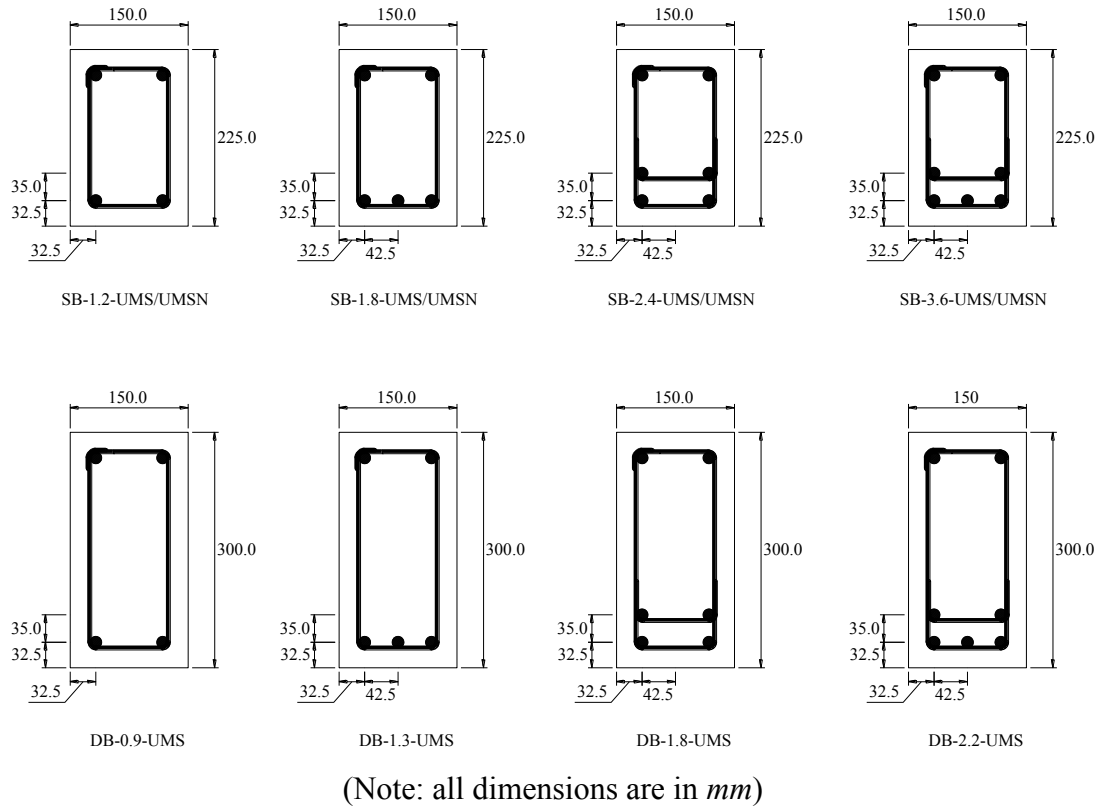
Structural configurations of the reinforced UHPC beam sections.
